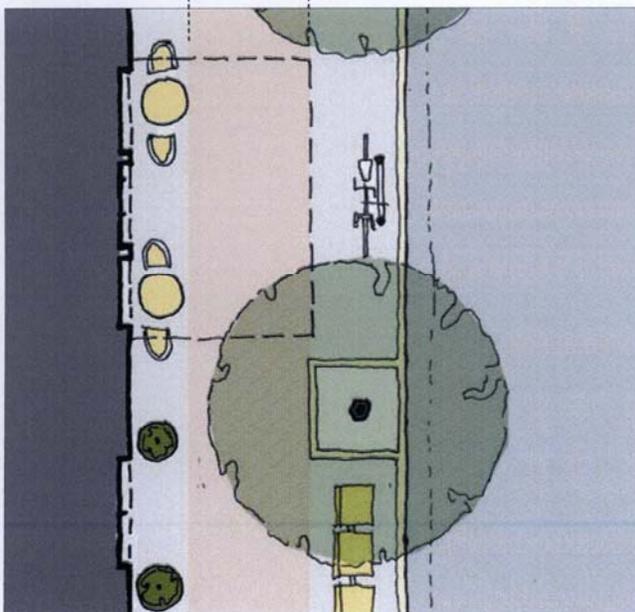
Plan diagram of sidewalk, with Pedestrian Zone highlighted
